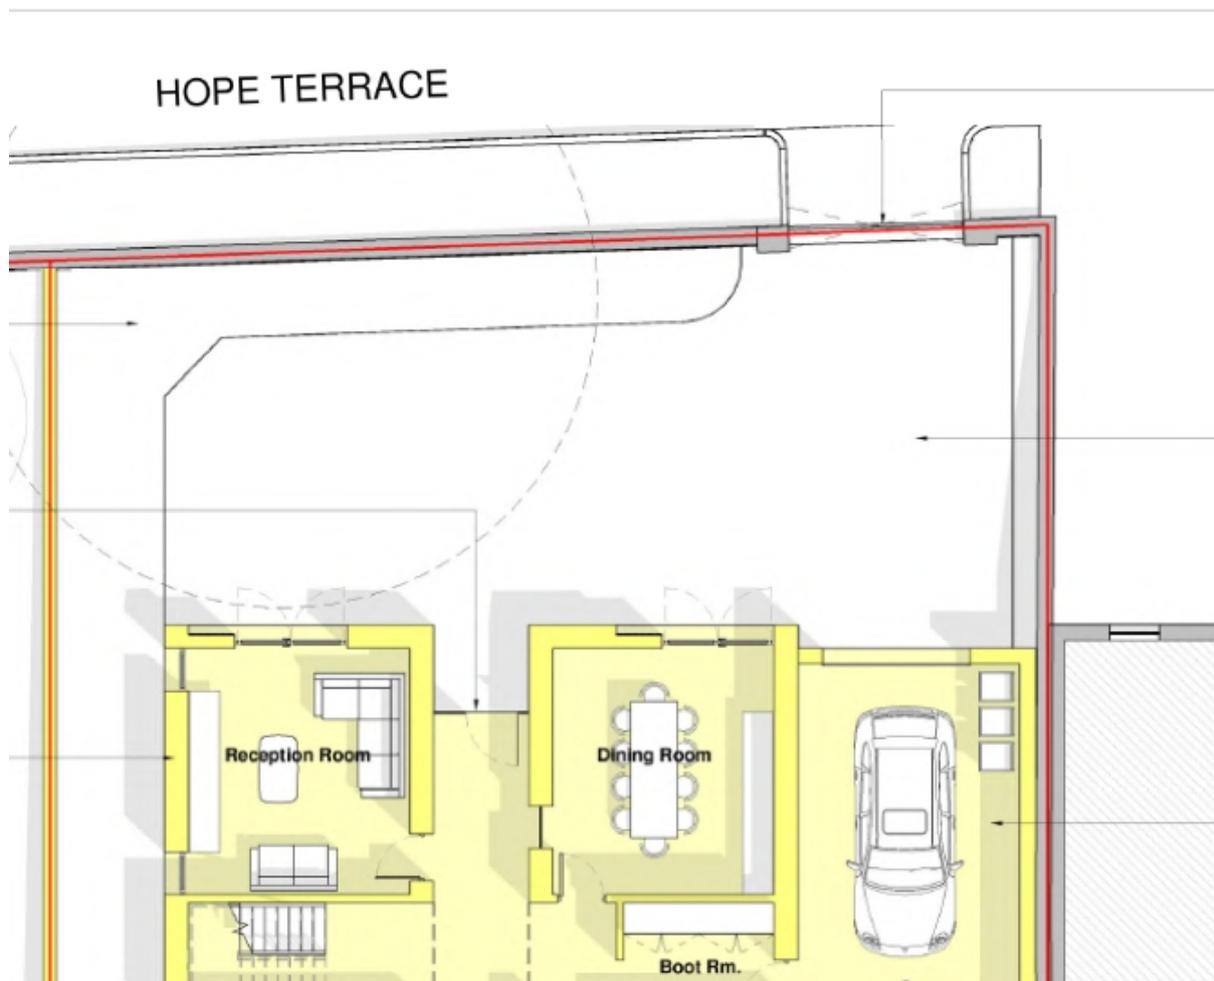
Proposed 16A Hope Terrace: Principal elevation only 7m from and not parallel with roadline
